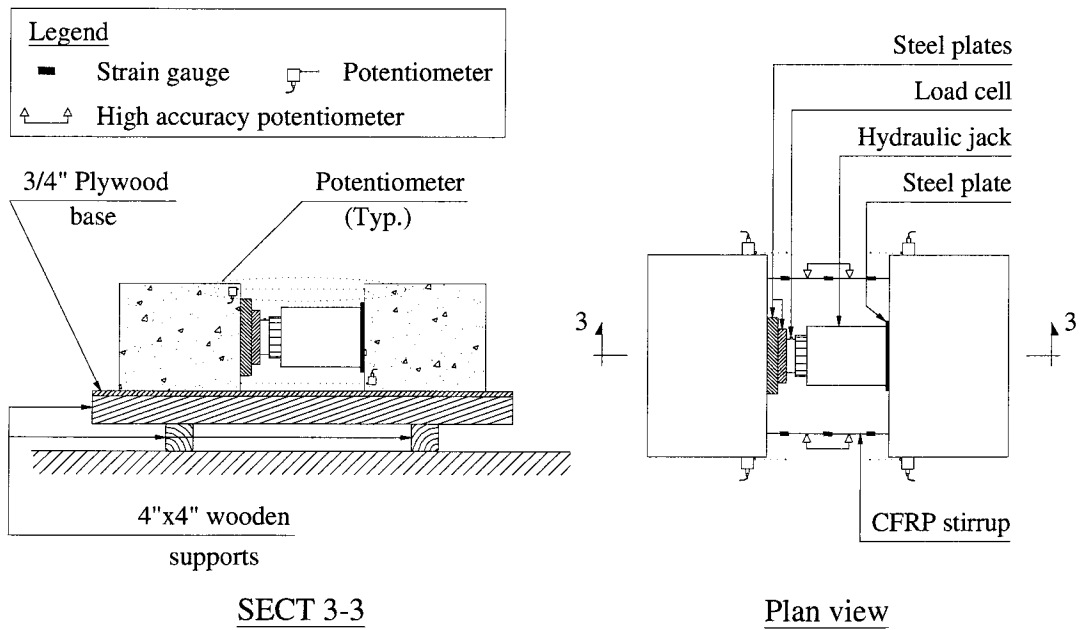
Test setup and instrumentation of stirrups and bent bars test
